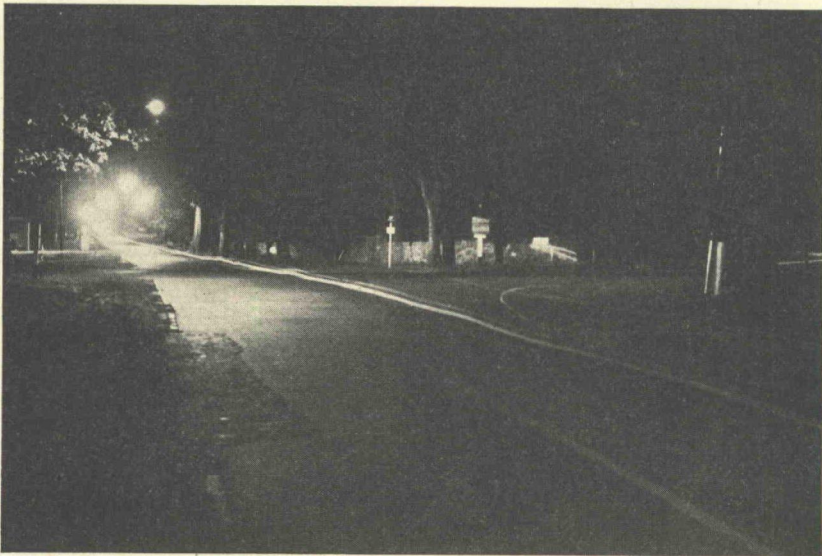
Safety Demonstration Lighting at Intersection of Route No. 6 and Parsippany Boulevard. Note illumination of entire roadway and shoulder.
